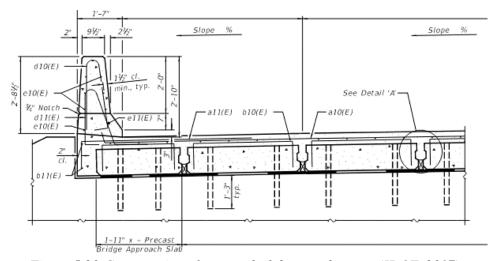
Cross section of approach slab near abutment (IDOT, 2017)
